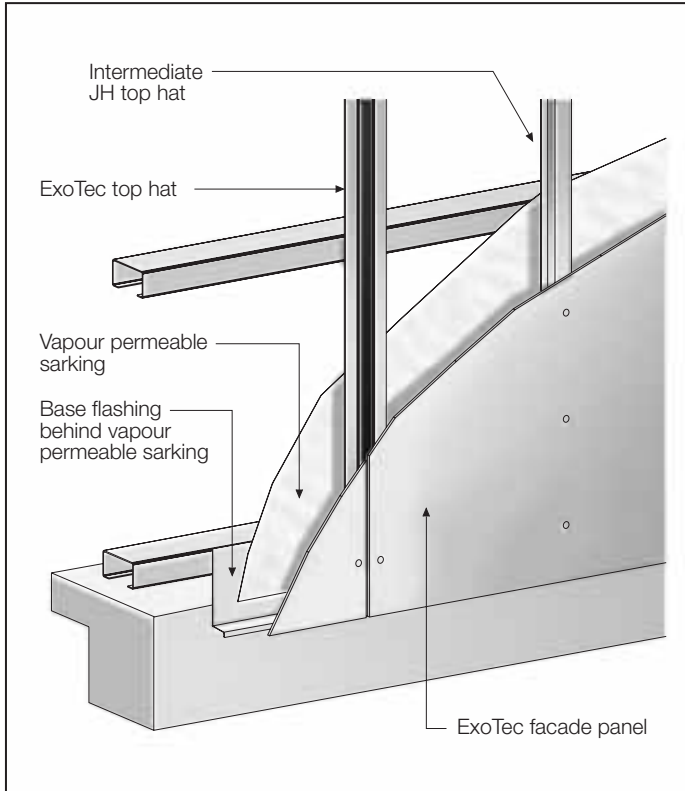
WALL BASE TYPICAL CUTAWAY DETAIL 1
